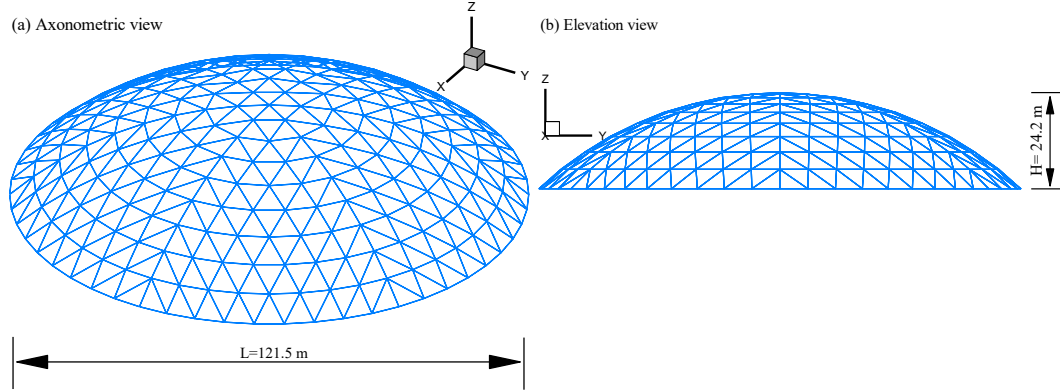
Structural model: (a) Axonometric view; (b) Elevation view
